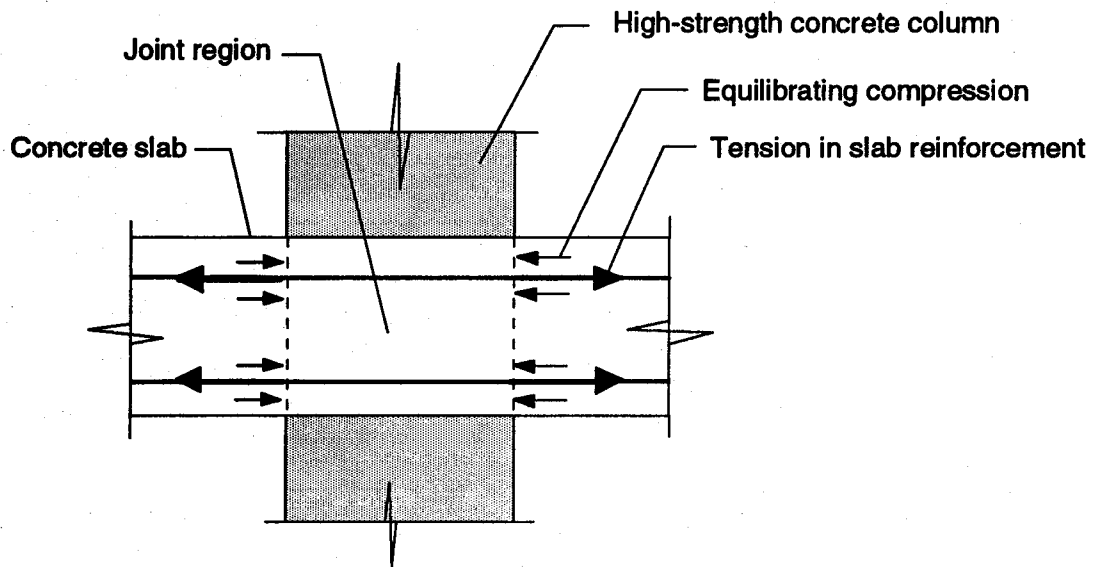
Stresses at Joint Region (Specimens with Unloaded Slabs)
